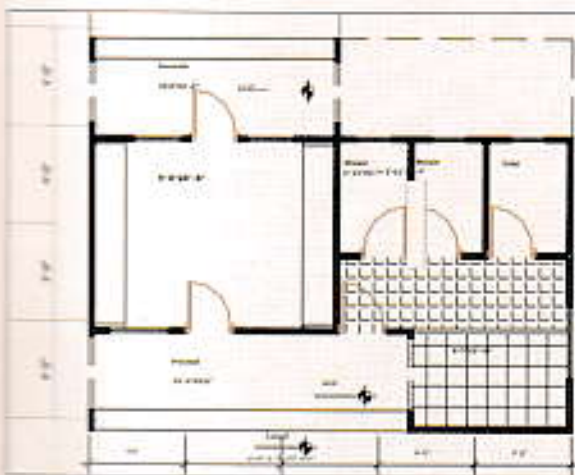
PLAN OF Model House (CSEB interlocking Block)
